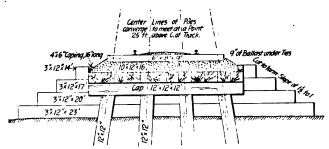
Ballasted Culvert; Southern Pacific Ry.
